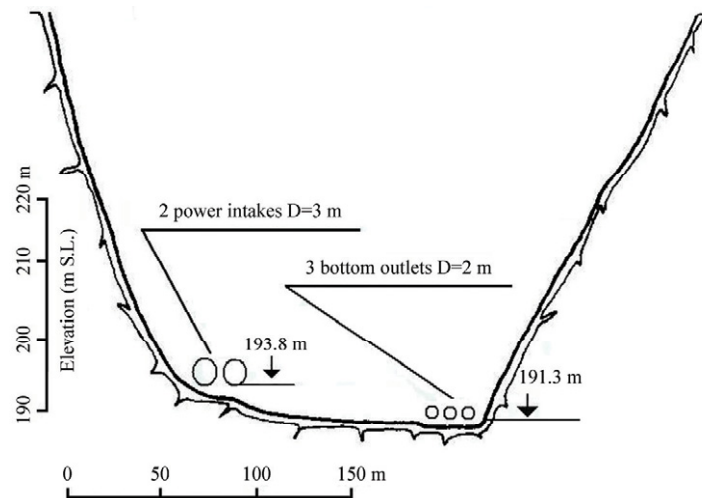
Cross section view of the bottom outlet system of the Sefid-Roud dam
